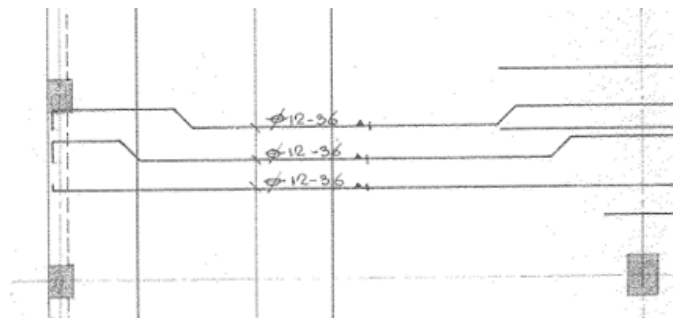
Reinforcement layout floor span Stationsplein 107
